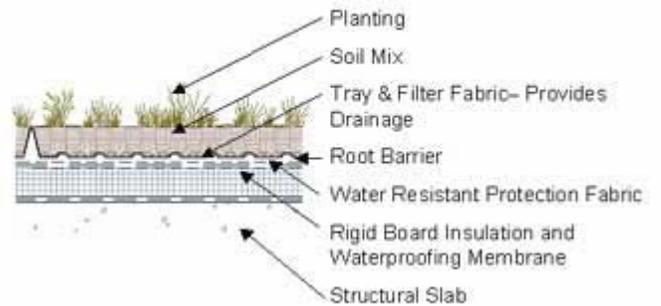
Green roof cross-section (Source: www.epa.gov/greeningepa/facilities/boston-hq.htm)
